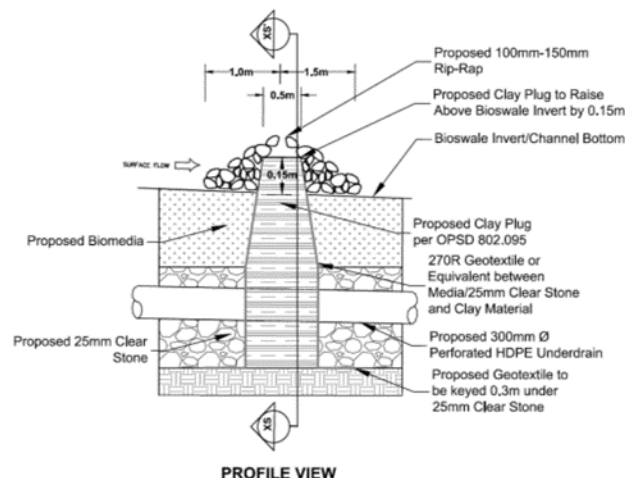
Typical Detail of a Bioswale with Check-dams
